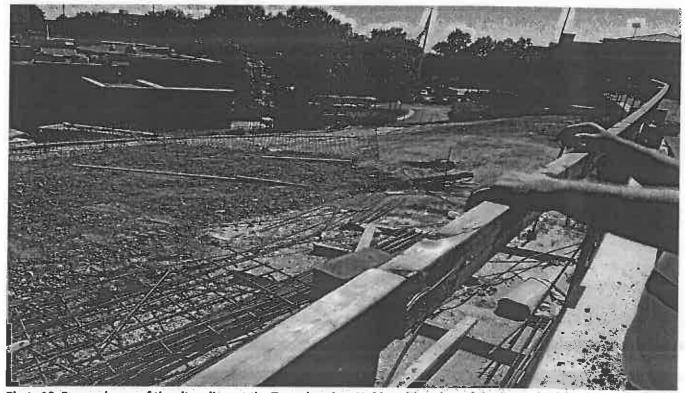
Exposed area of the site adjacent the Tunnel project N side, with a view of the Gossette Building
